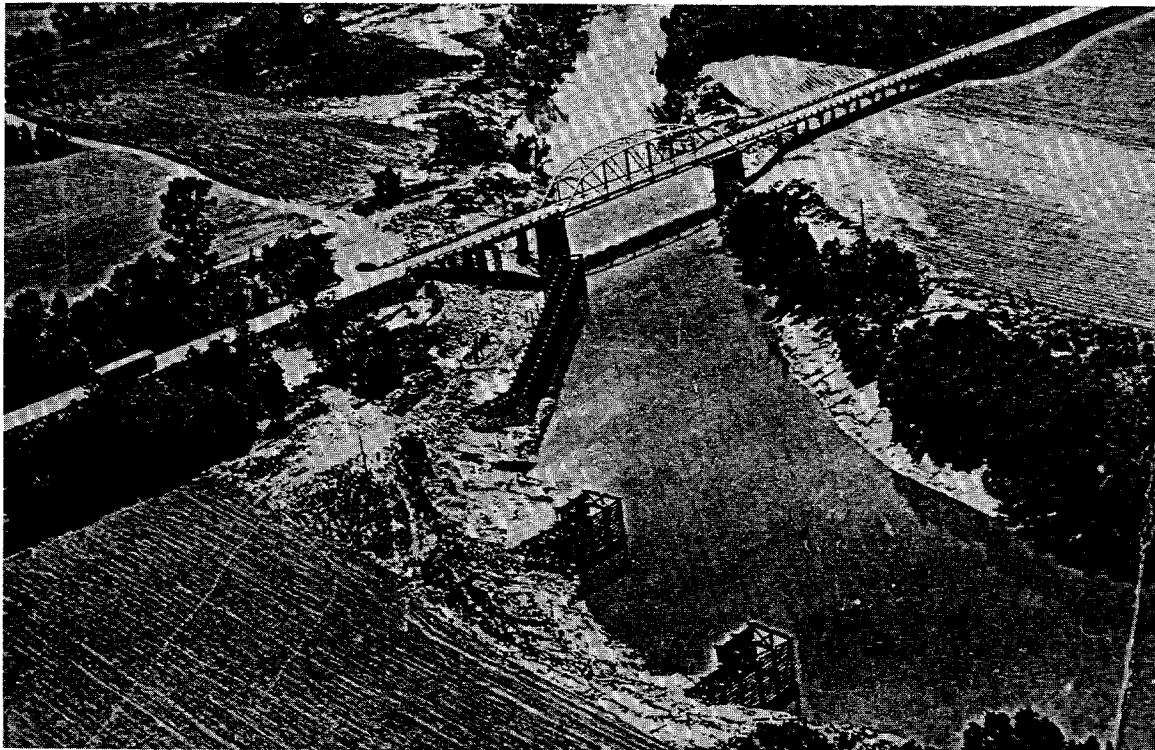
Oblique aerial view, looking downstream, of timber pile spurs. (From U.S. Army Corps of Engineers.)
